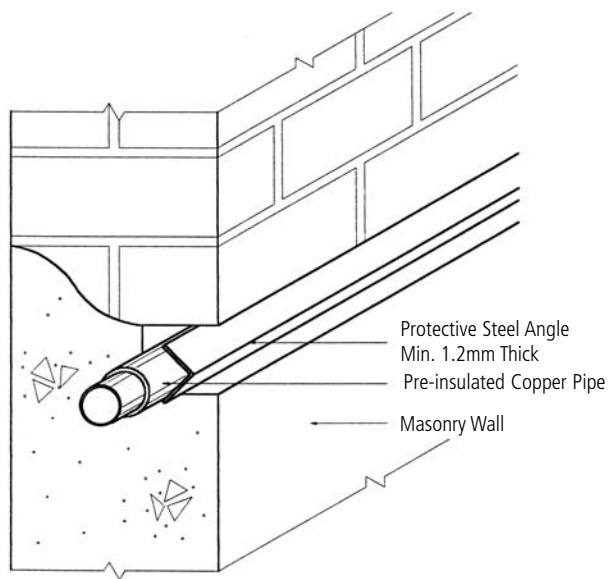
PIPE EMBEDDED IN SOLID WALL
